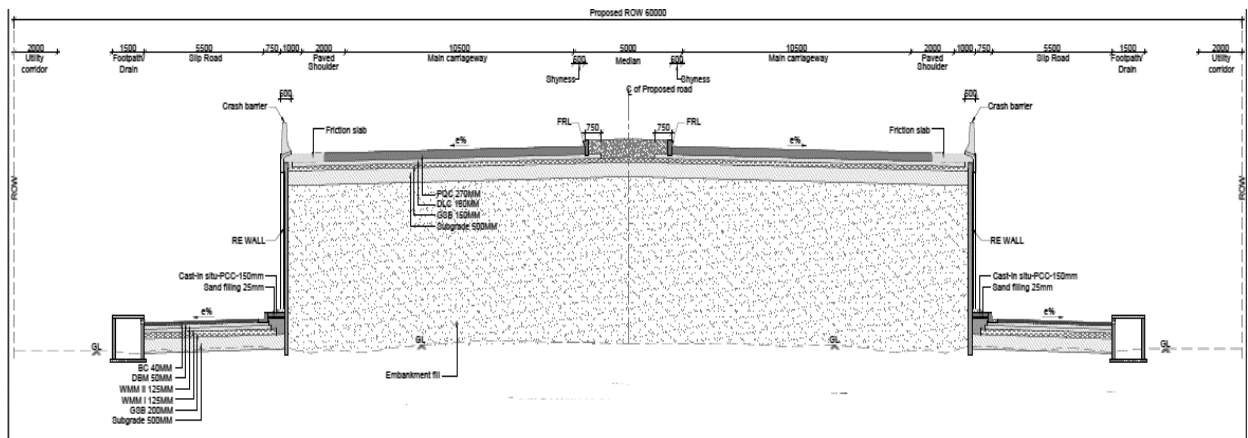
(TCS-6C) 4 Lane Underpass Cross Section With Slip Roads In Bypass & Realignment
